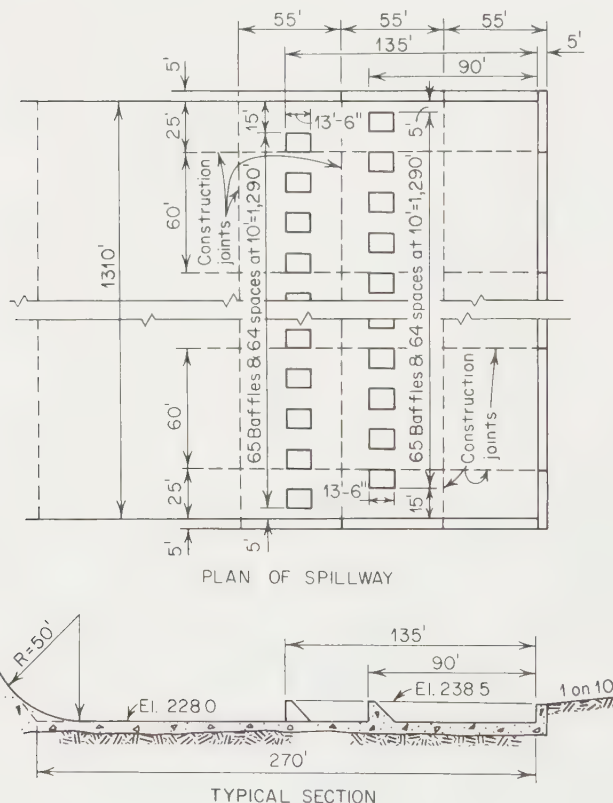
Typical section—stilling-basin dimensions, McNary Dam.
